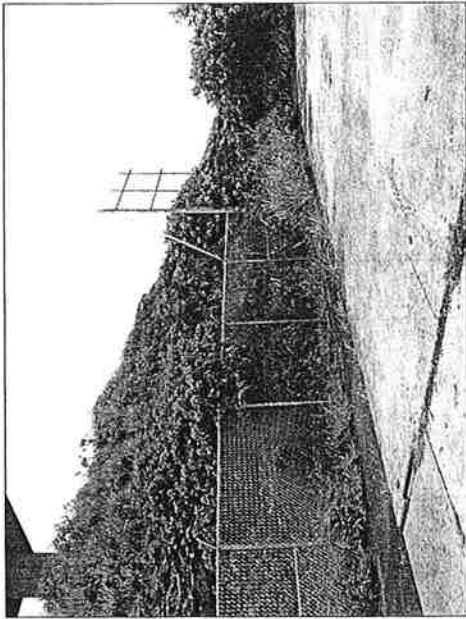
Photo showing the cut hillside adjacent to Foundation A, view to north
